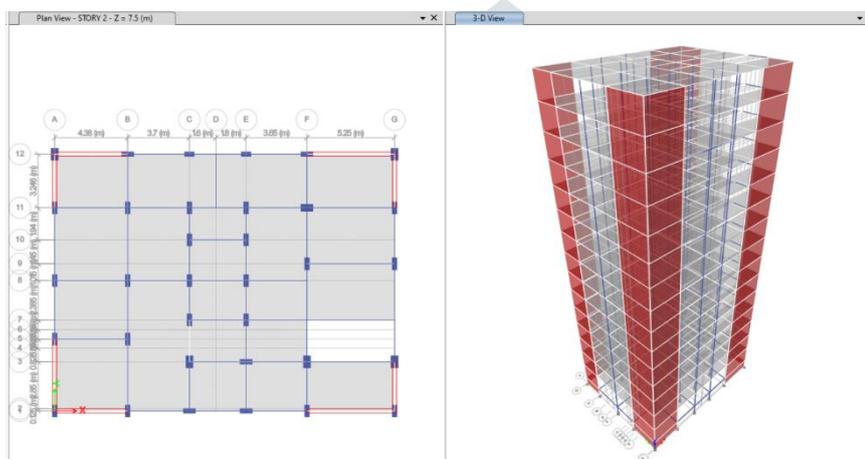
Shear Wall Layout and Elevation of Shear Wall Structure
